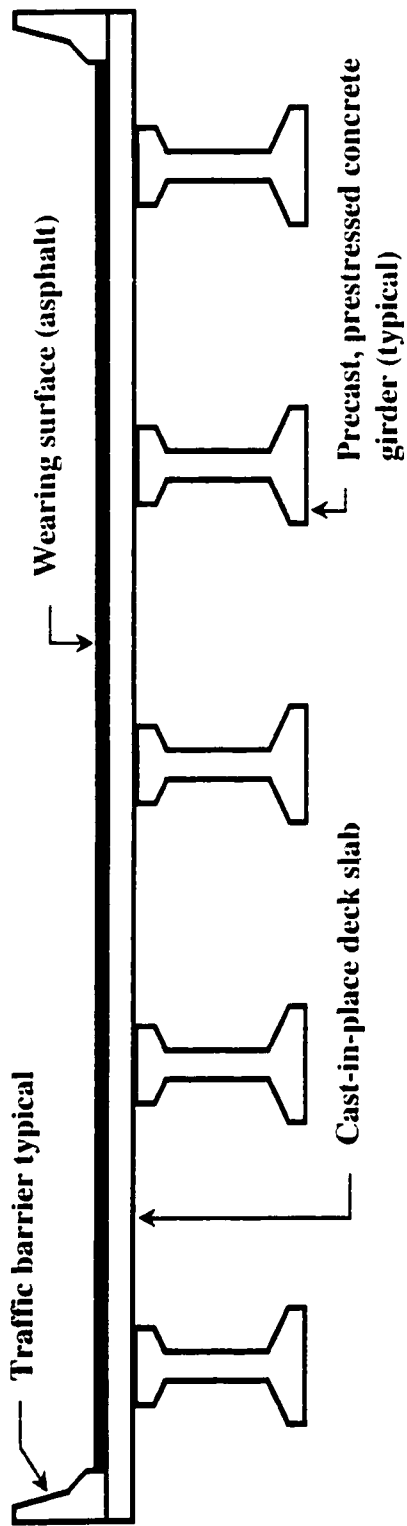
Typical Slab-on-Girder Bridge Cross Section
